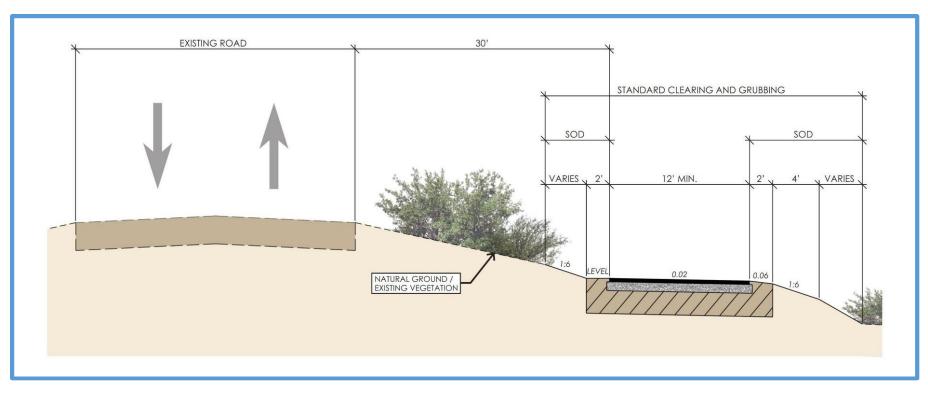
Typical Section, N-S MINWR Alternative 3
